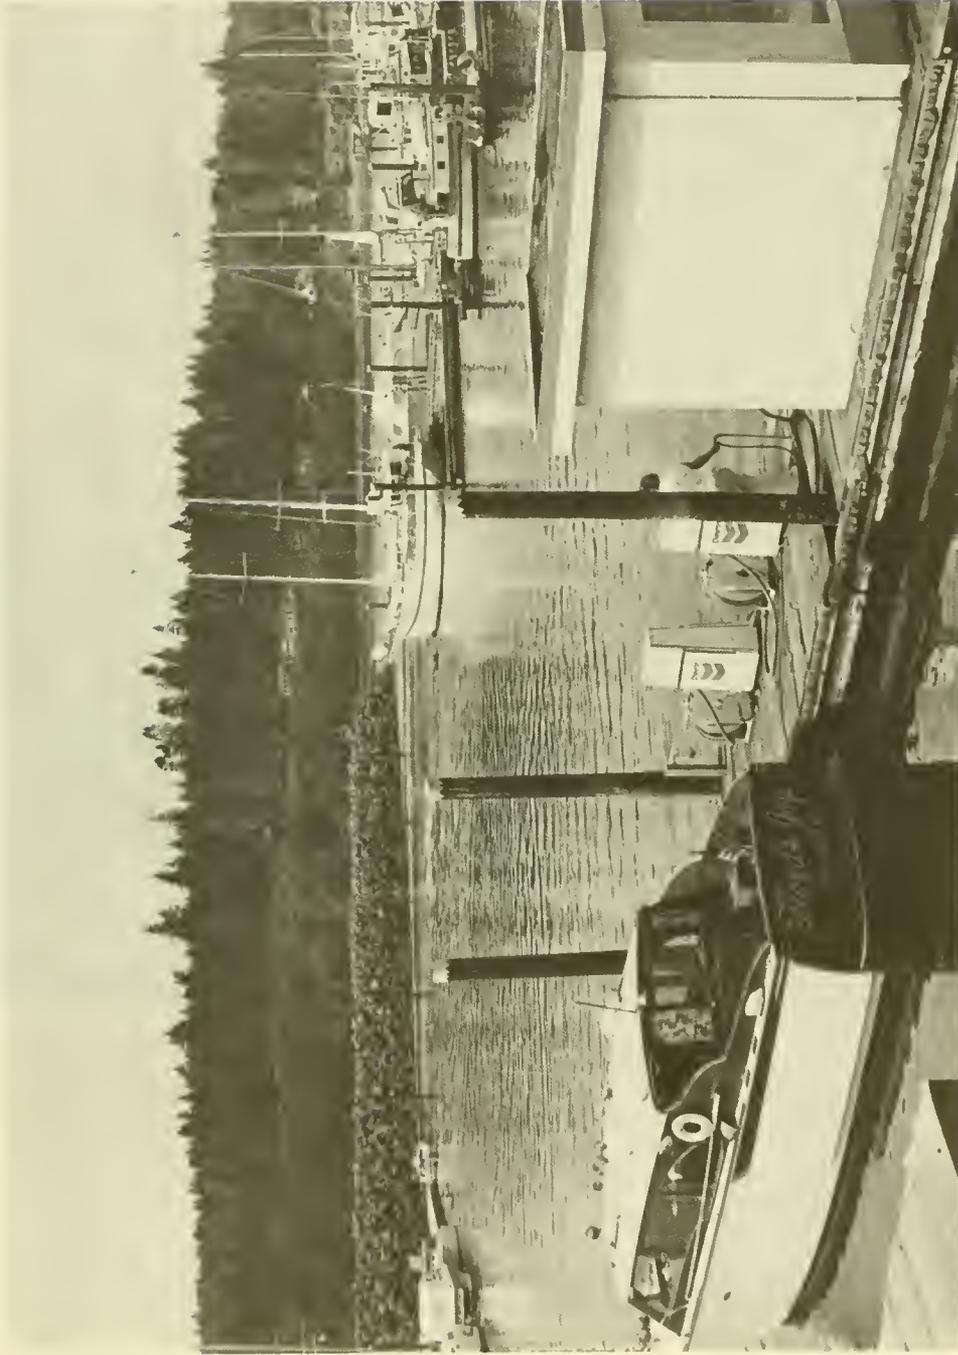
Floating pier at Kingston Marina, Kingston, Washington. Note rubble mound breakwater in background. Photograph by C. A. Francisco
